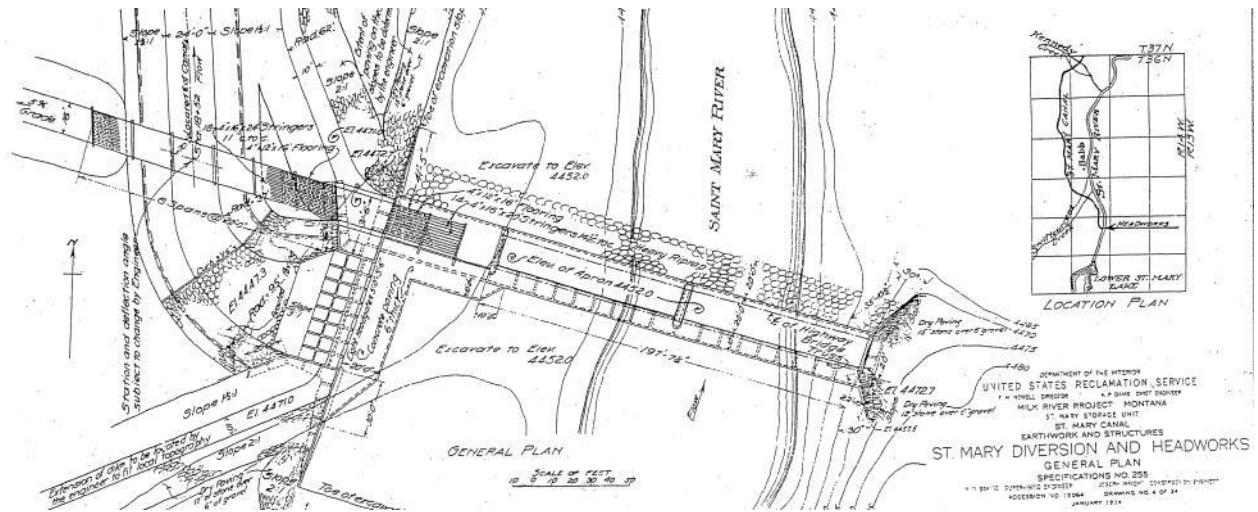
Original plan view drawing of the existing St. Mary Diversion Dam and Headworks (January 1914 – note: elevations are based on project datum that is approximately 4.27 meter (14 feet) lower than NAVD88)
